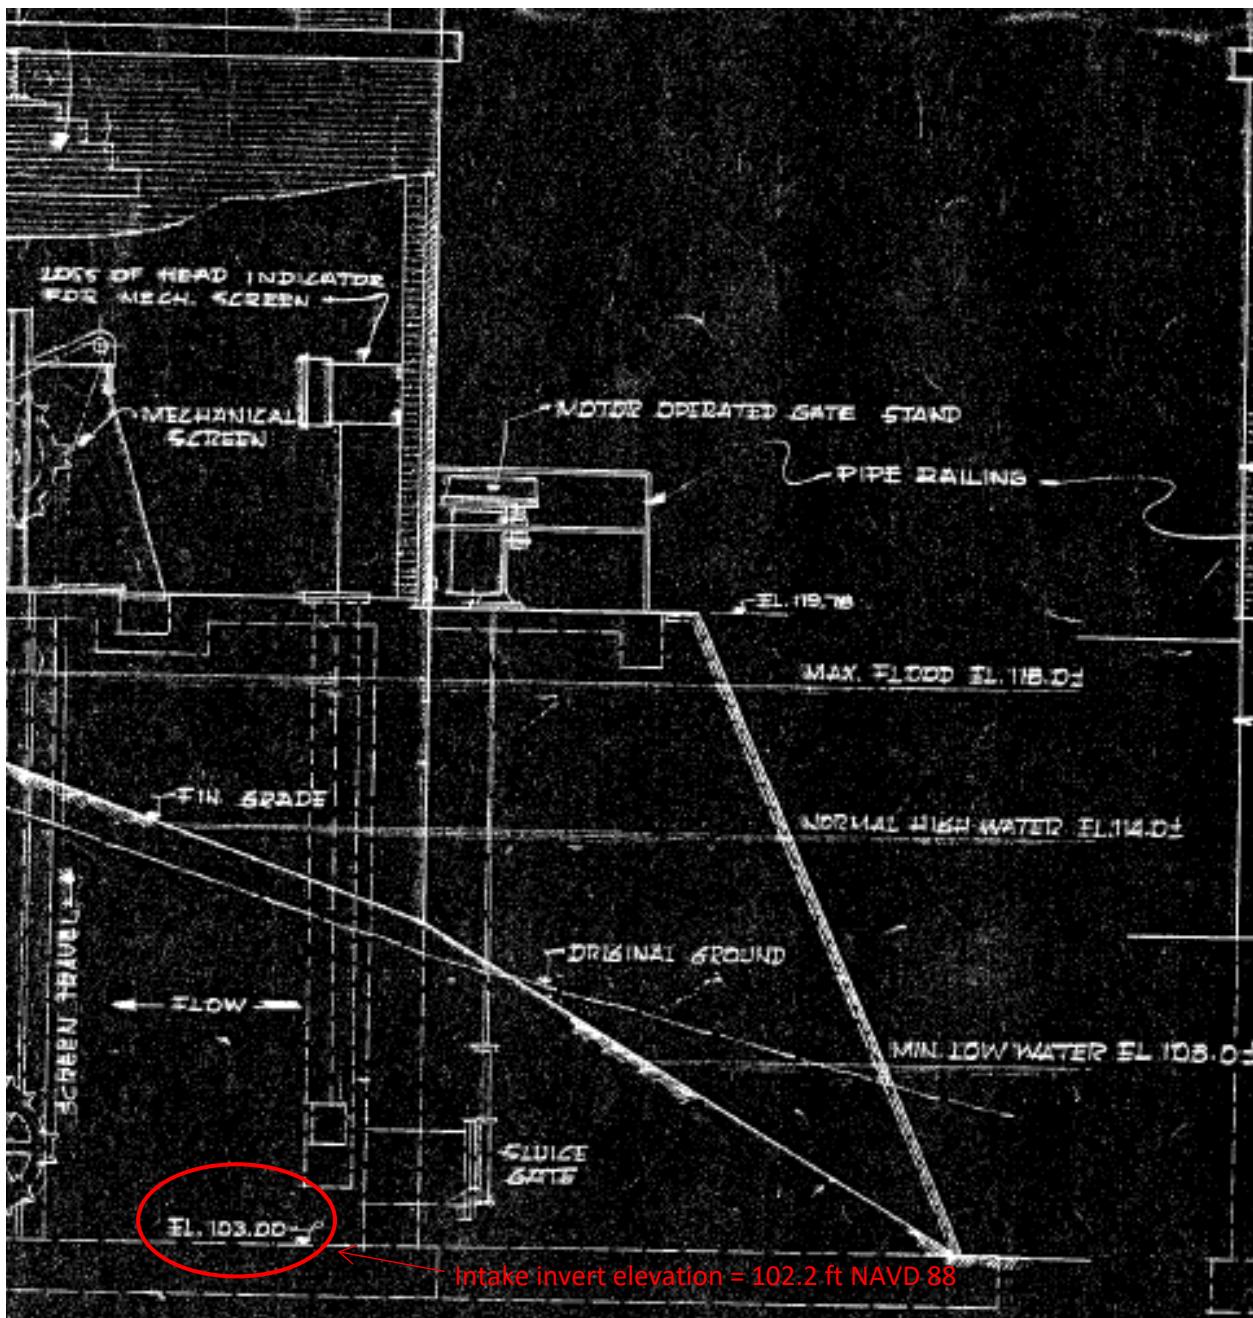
Billerica Water Supply Intake Elevation Detail
